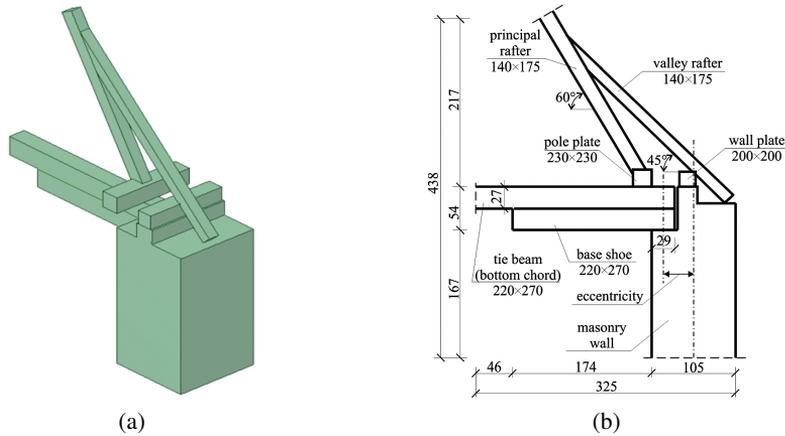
Supporting a roof truss on masonry walls: a) three-dimensional geometric model of a separated structure strip, b) 2D sketch with marked structural elements of the connection
